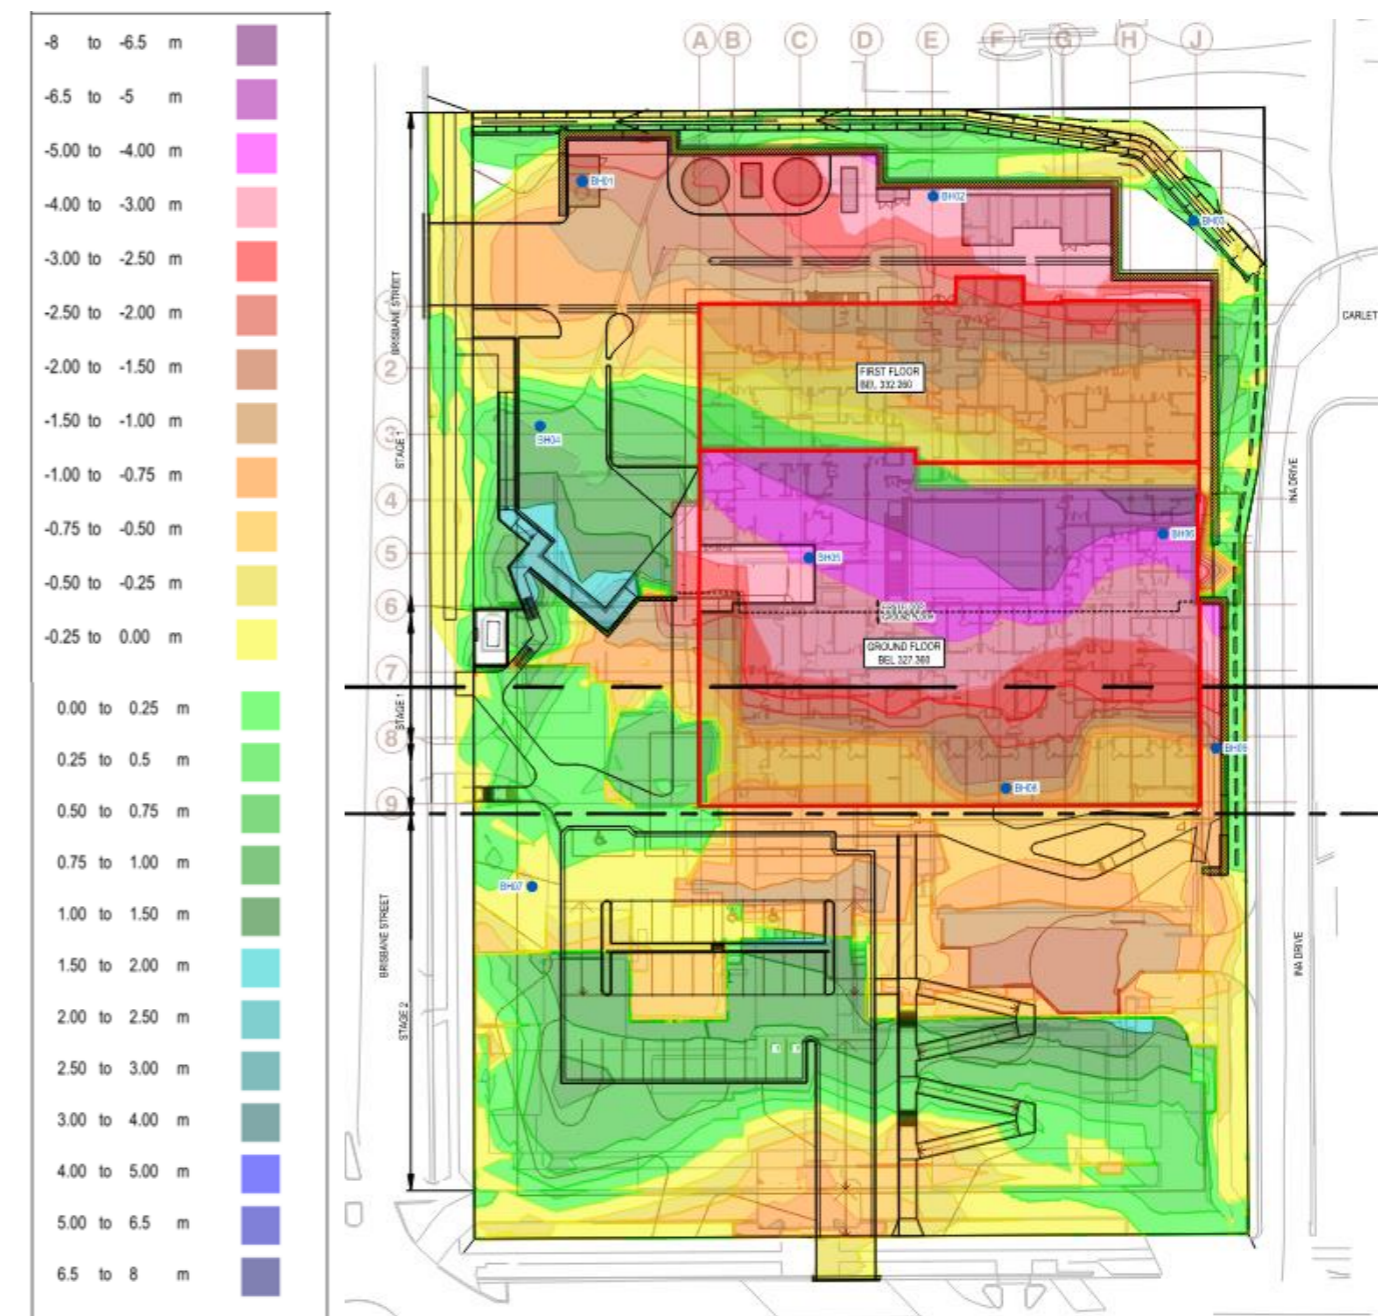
Cut and Fill Plan of Proposed Earthworks
